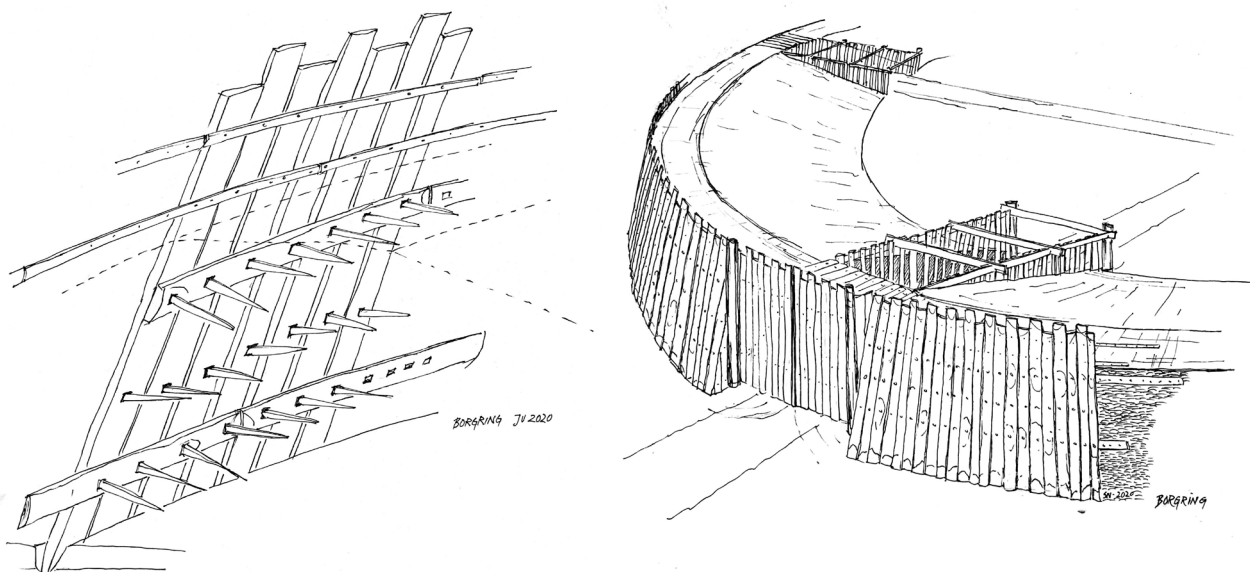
Left) Reconstruction drawing of the palisade construction components; The two different sizes of vertical cladding planks, the four runs of stringers and the large wood pegs used for fixing the vertical planks on the rampart frontage with the stringers and the rampart turfs; Right) Reconstruction drawing of the Borgring fortress palisade and rampart (Drawings: Søren Nielsen and Jens Ulriksen).
